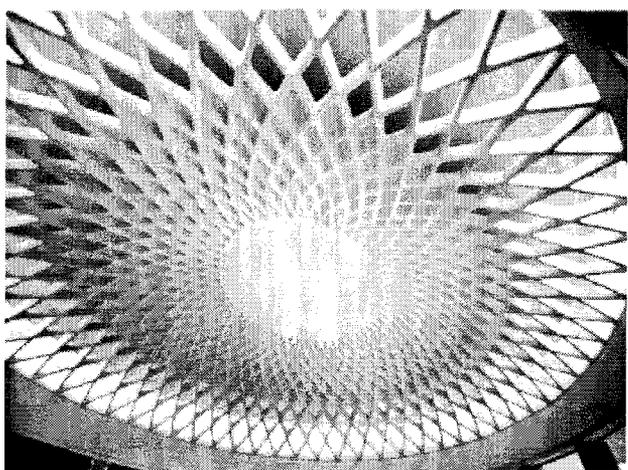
Terme di Chianciano, Pier Luigi Nervi, 1952. Roof structure showing pattern of ferro-cemento formwork.
